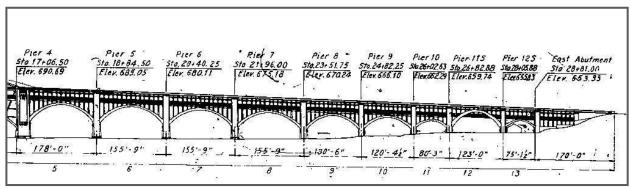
Partial south elevation of CUY-6-1456 (Span 5 – East Abutment shown).
